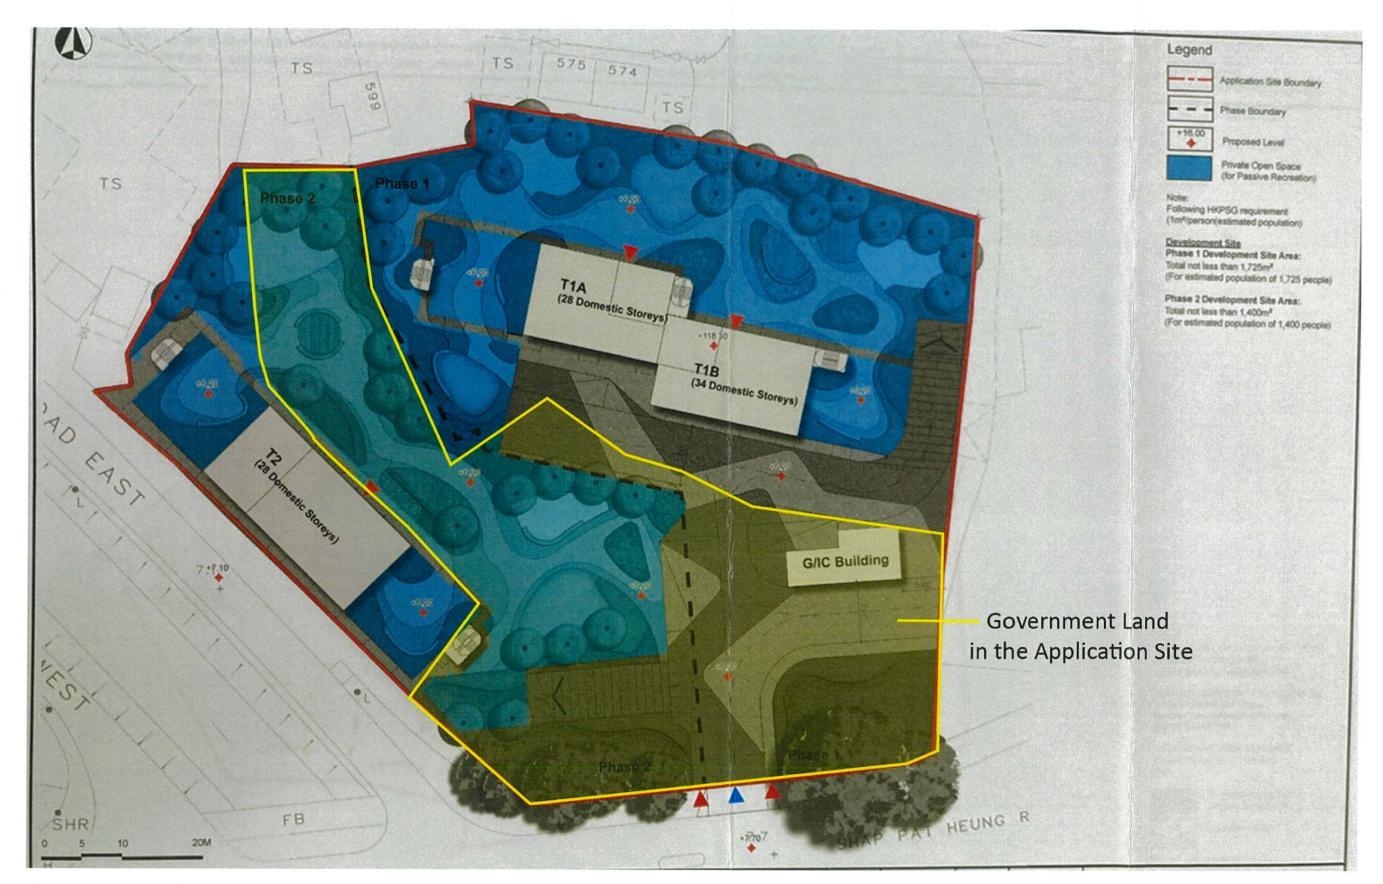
Location of Private Open Space and the government land in the application site (source: the application (no. Y/YL/19))
